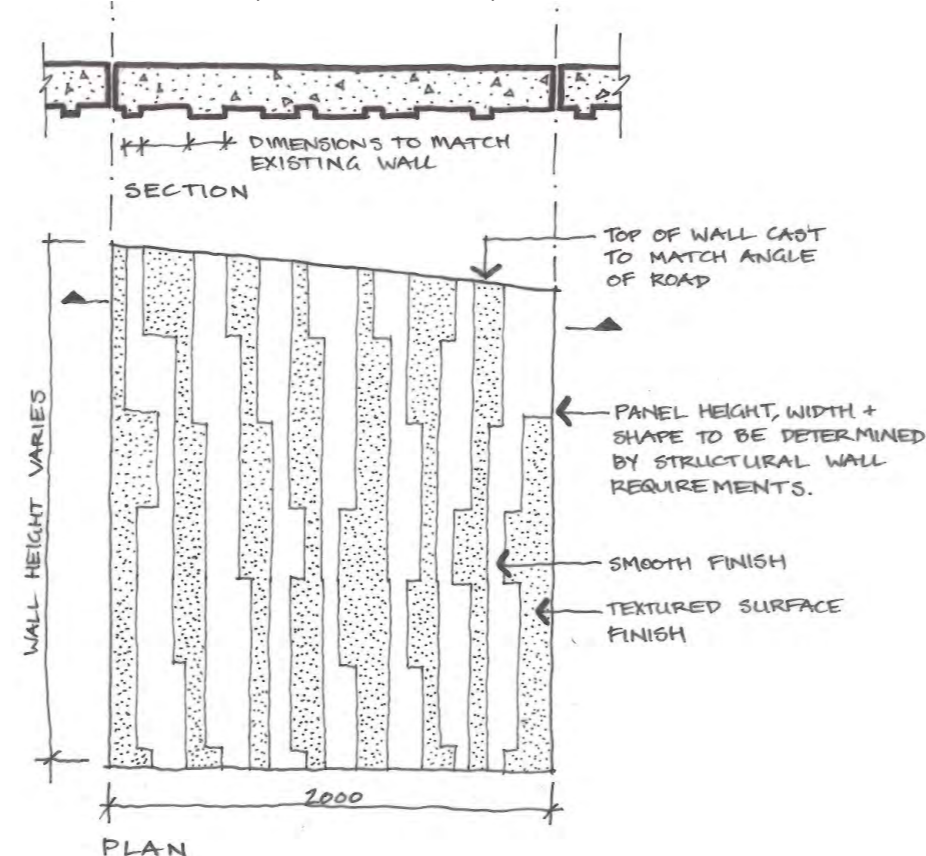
Retaining Wall Section and Elevation Detail
